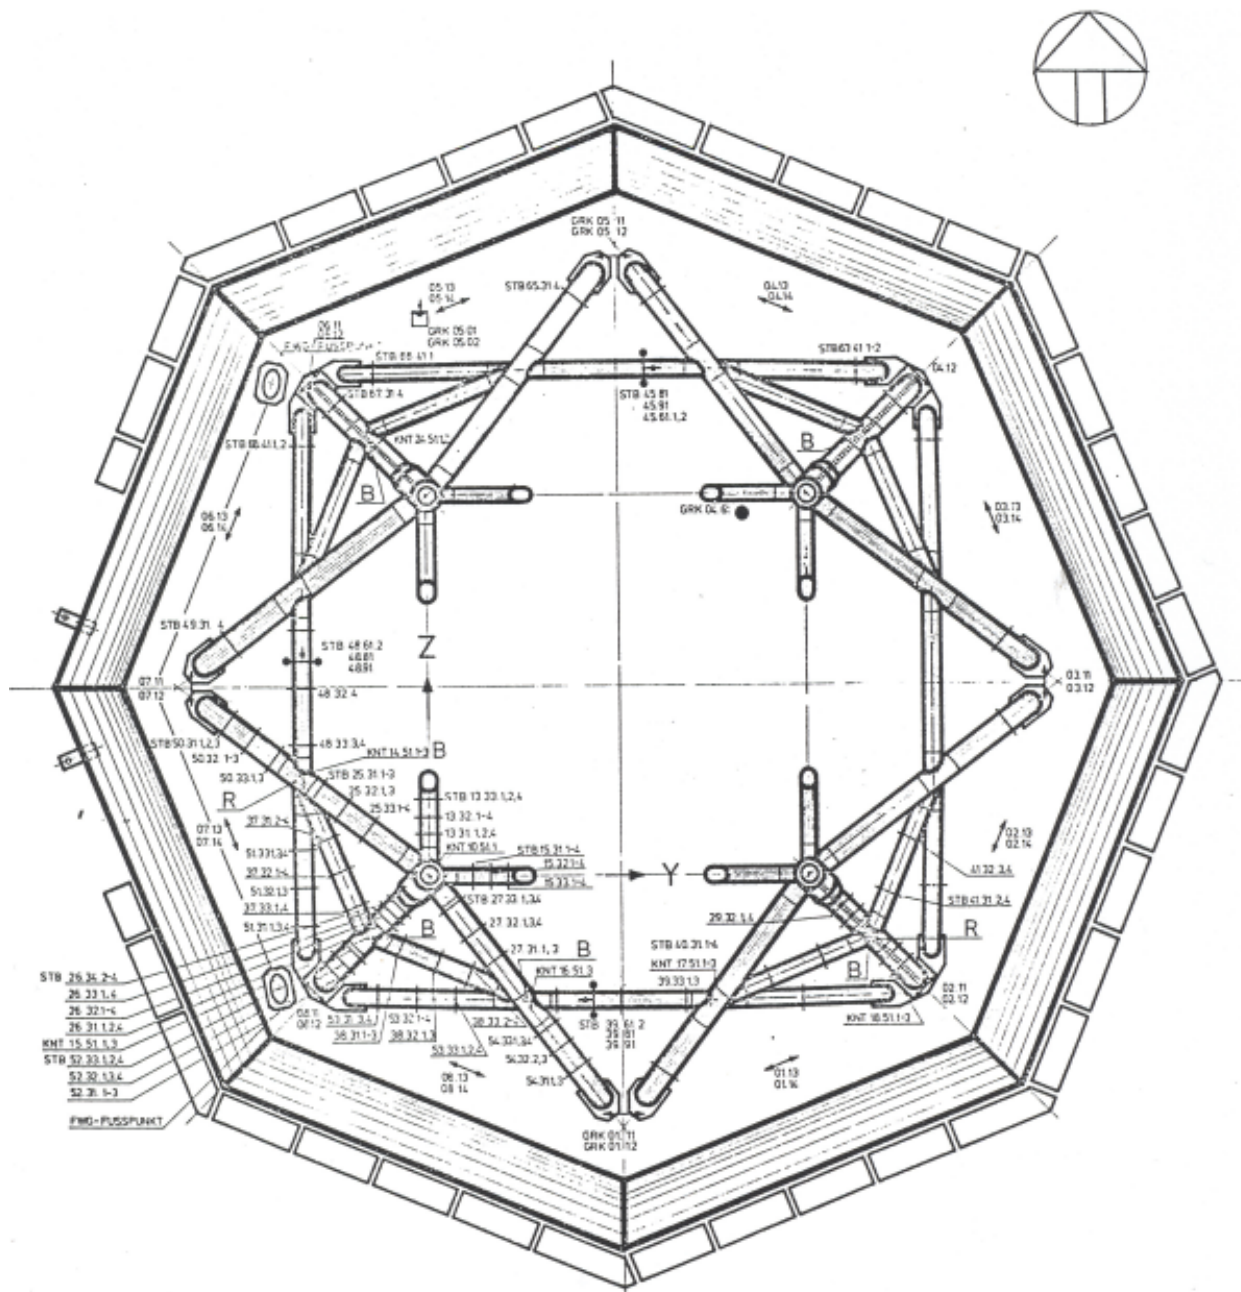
Instrumentation (horizontal section at 13.5 m)
